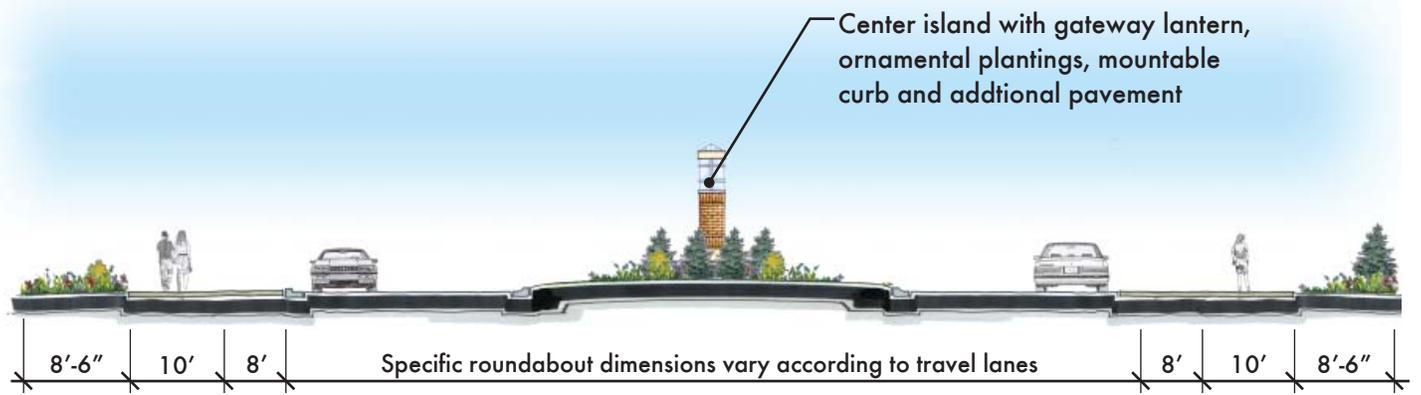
Typical cross-section of roundabout treatments. Roundabout intersections feature similar pavement treatments as primary intersections to continue the design theme.
